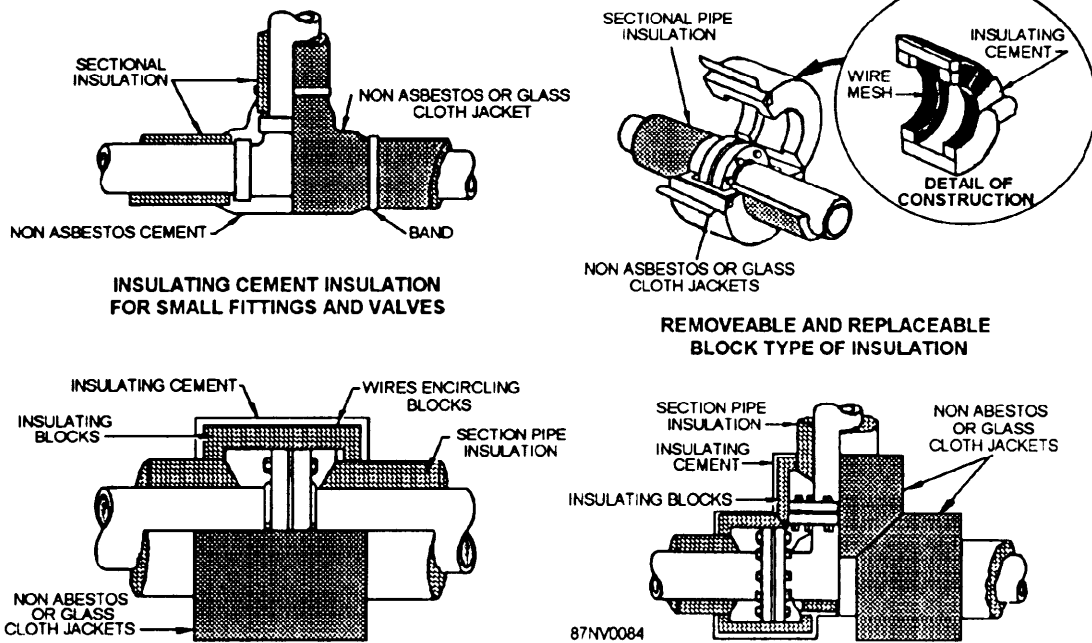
Permanent-type insulation of pipe fittings, flanges, and valves.
